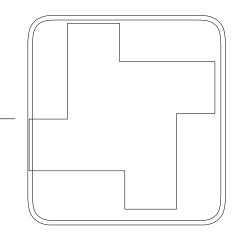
Diagram showing retained structural elements in this option (section above and slabs opposite)
